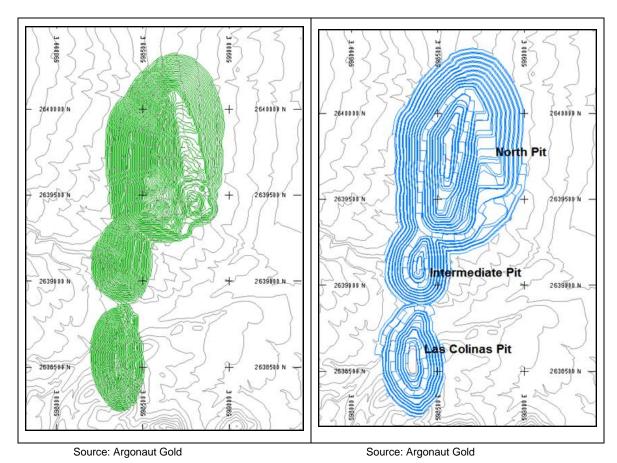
US\$1,200 Pit Shell Figure 14.2.1.2: Pit Design
